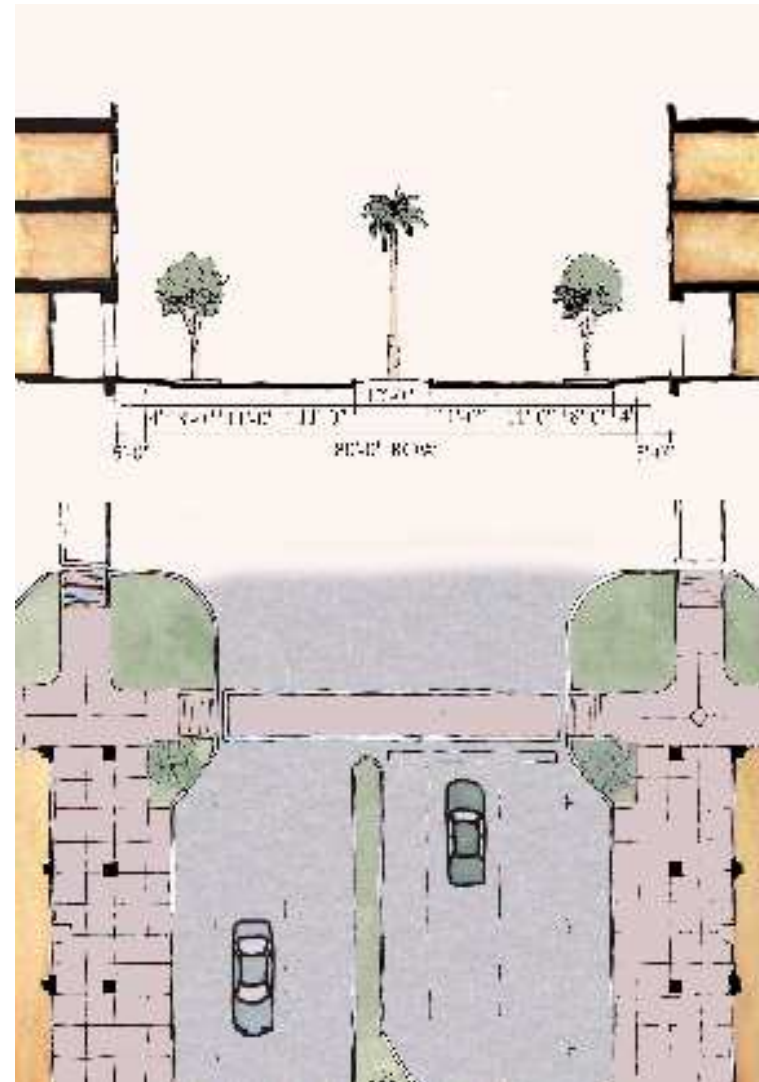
Four Lane Proposed Plan and Profile of Westgate Avenue
